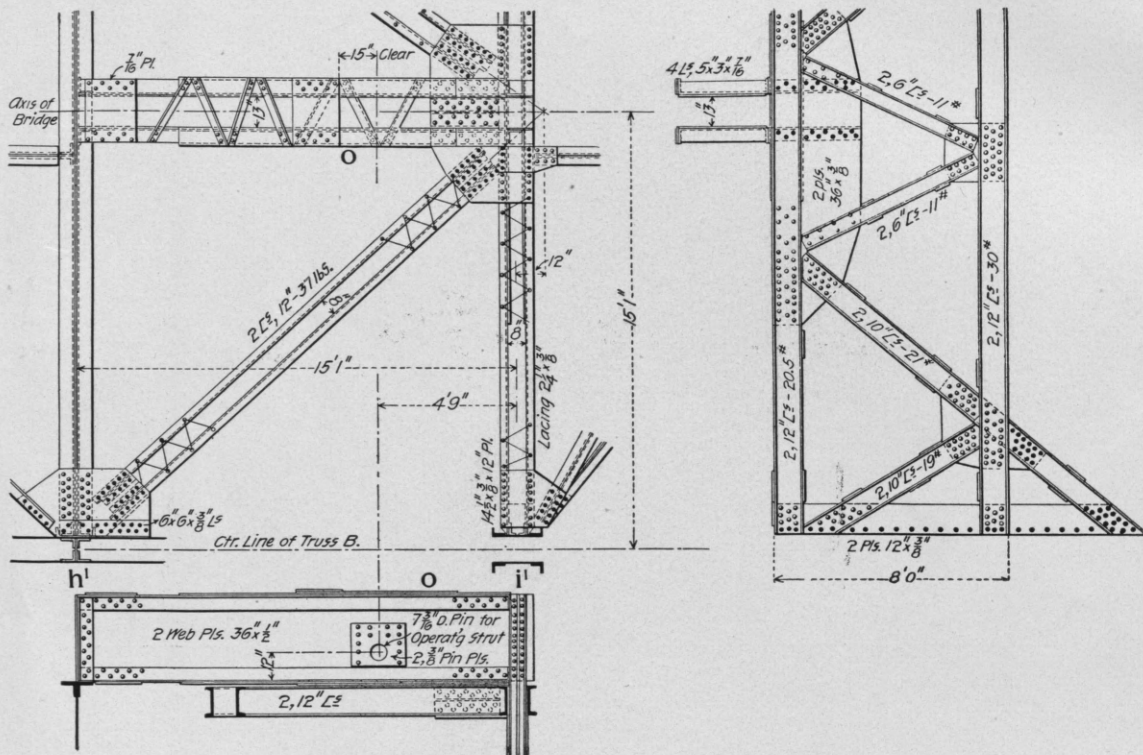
Part of Span Showing Operating Strut Connections on Box Girder.
